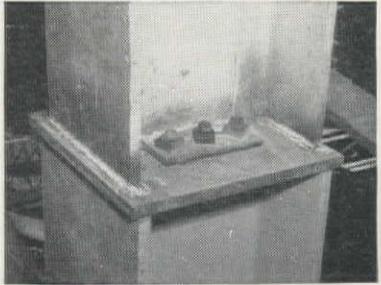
Typical Welded Splice of all columns 12 to 12 and 12 to 14 WF column. Bearing plate is shop welded to lower column... clip angle for erection bolts is shop welded to upper column. All field welds are made in fast, easy downband position.
